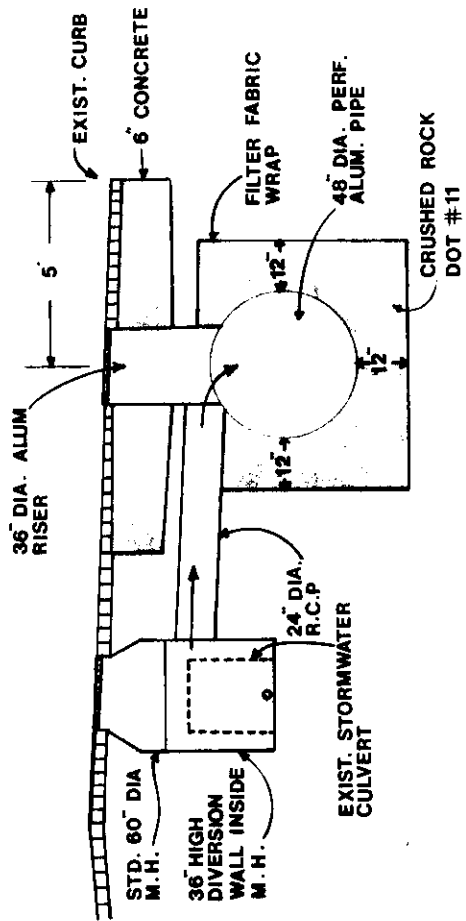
UNDERGROUND PERCOLATION SYSTEM SECTION
